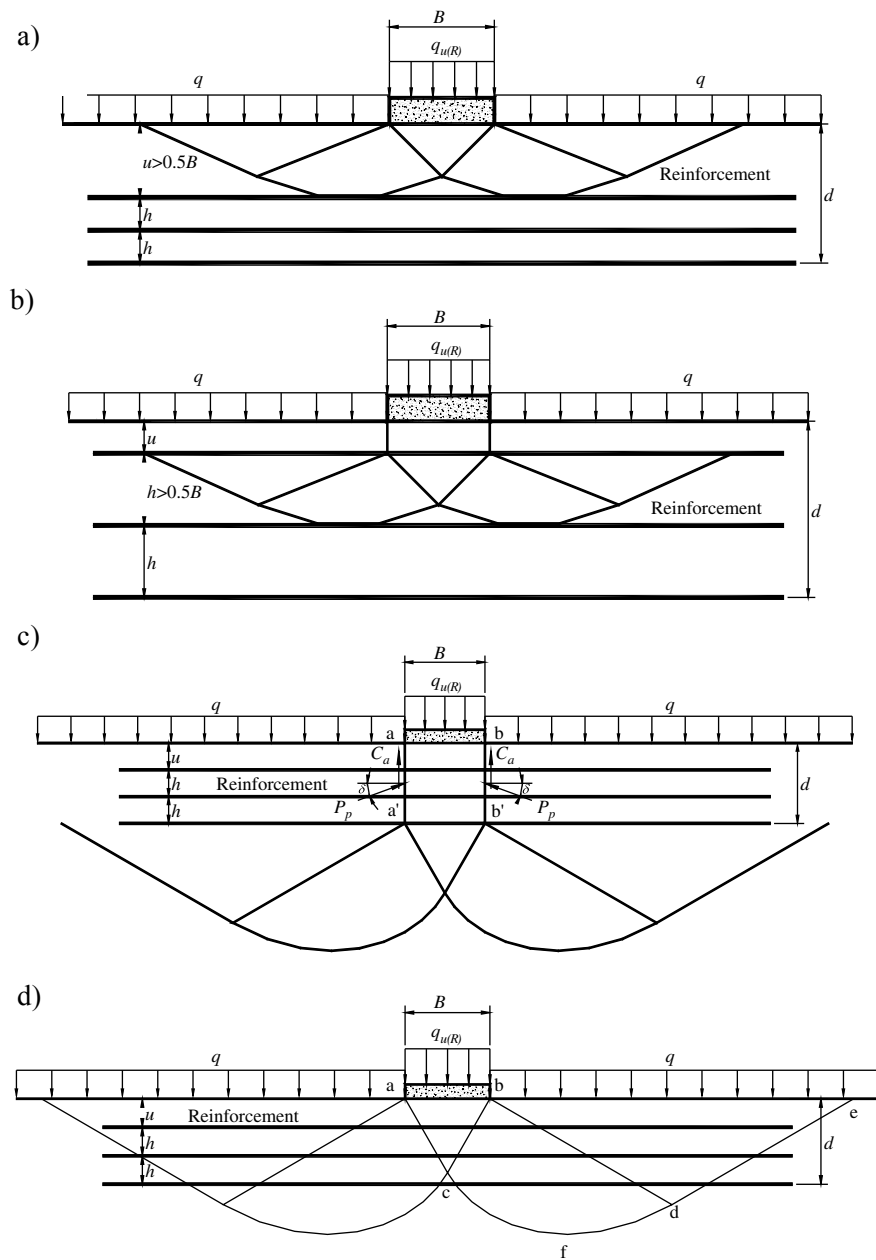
Failure modes of reinforced soil foundations. (a) Failure above the top layer of reinforcement (after Binquet and Lee, 1975a,b). (b) Failure between reinforcement layers (after Wayne *et al.*, 1998). (c) Failure similar to footings on a two-layer soil system (after Wayne *et al.*, 1998). (d) Failure within reinforced zone (Sharma *et al.*, 2009).
